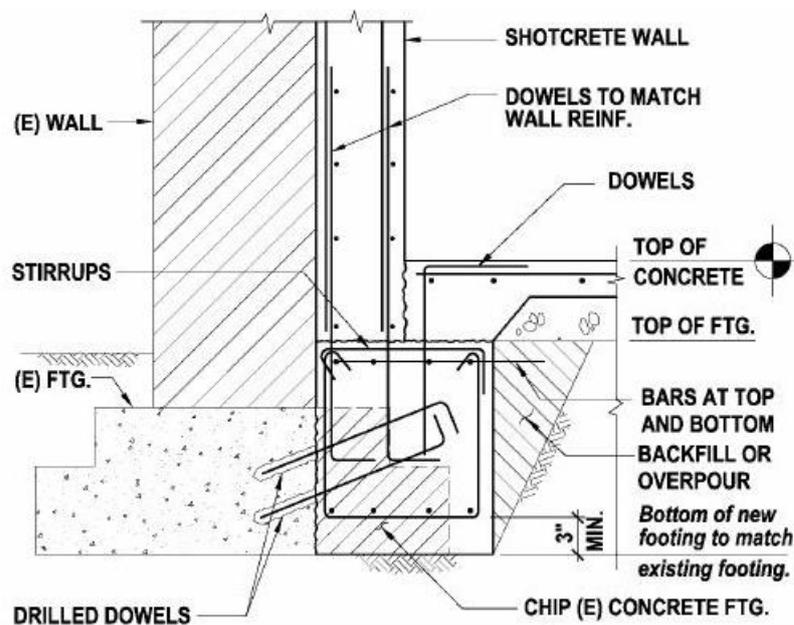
New concrete strip footing next to existing strip footing [1].
